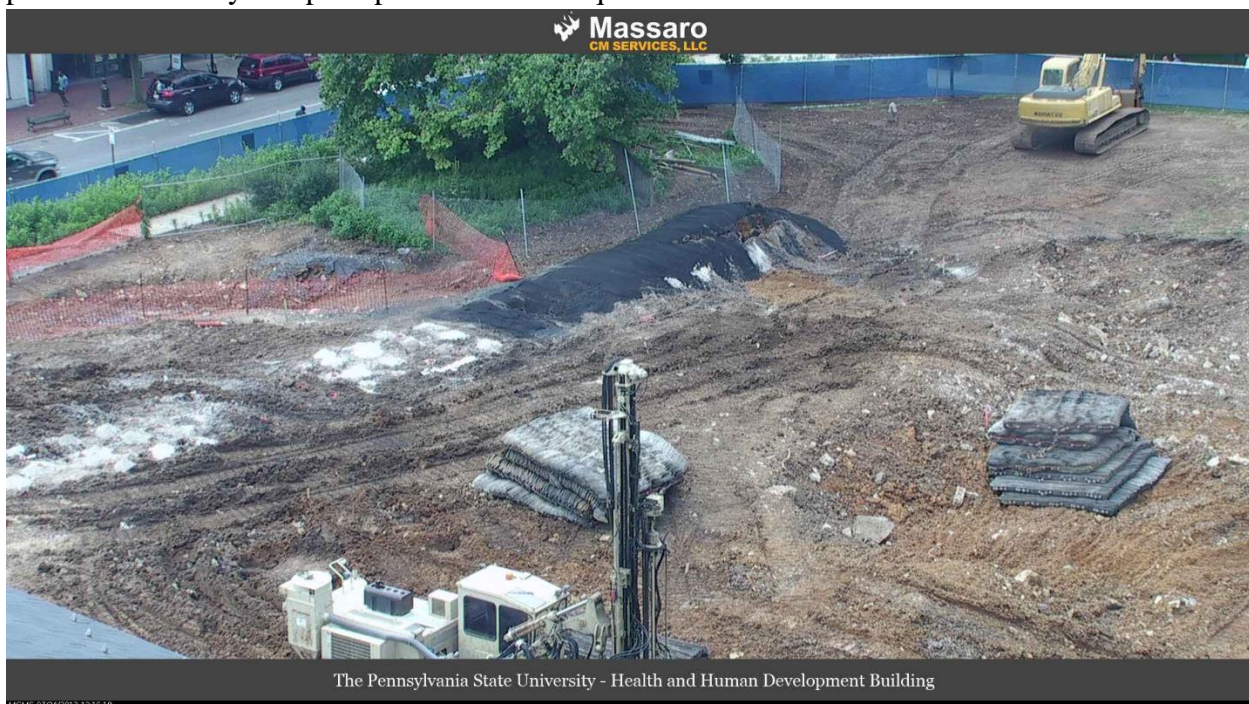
Rock Excavation Blasting Site Overview Photo Courtesy of Massaro CMS Webcam
